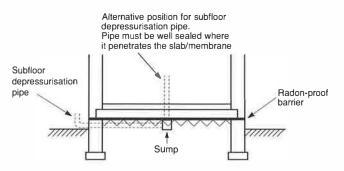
Radon-proof barrier in in-situ or ground-supported concrete floor
